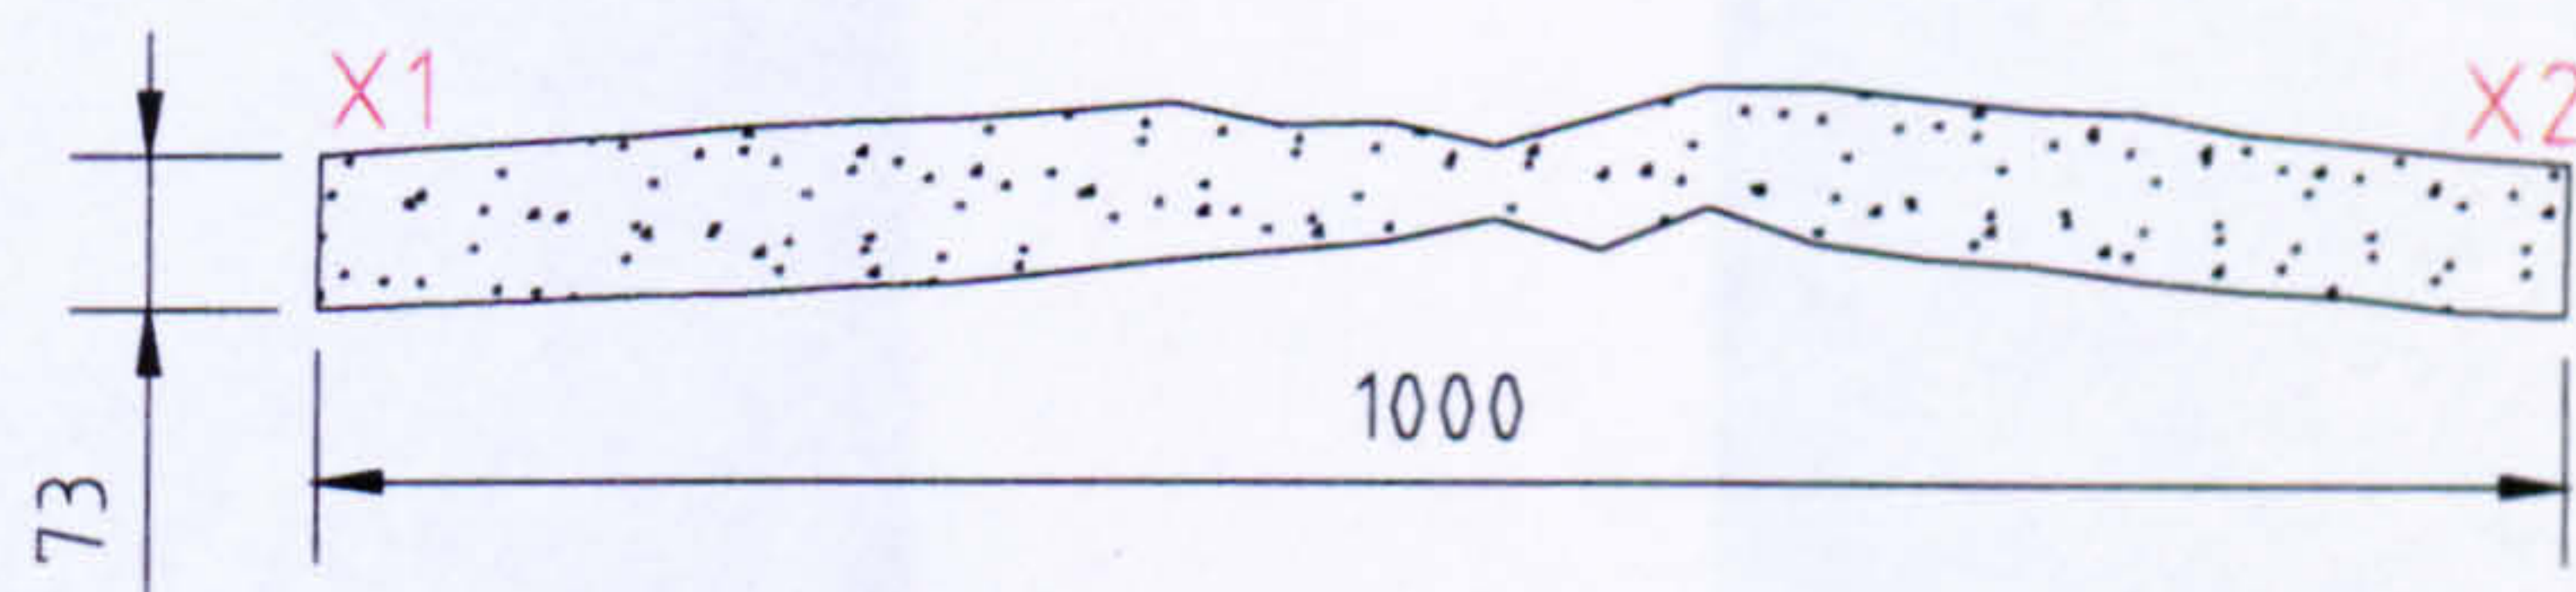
Cross-sectional elevation through X1-X2 of secondary slab RCB73IT7 indicating flexure
